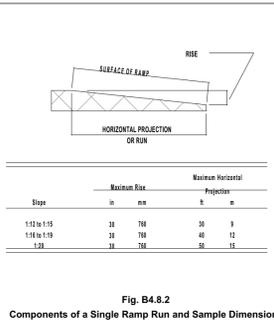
Components of a Single Ramp Run and Sample Dimensions
